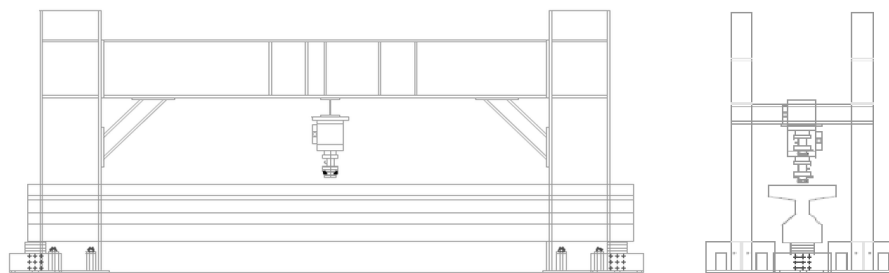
Side- and front view of the steel gantry with hydraulic jack [72]
